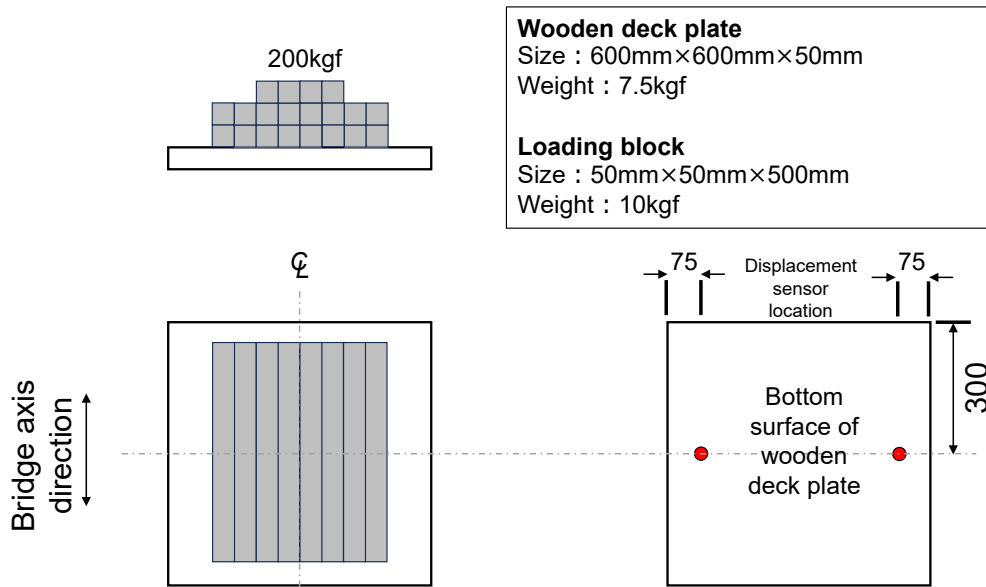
Overview of Wooden Deck and Weight Placement (Unit: mm)
